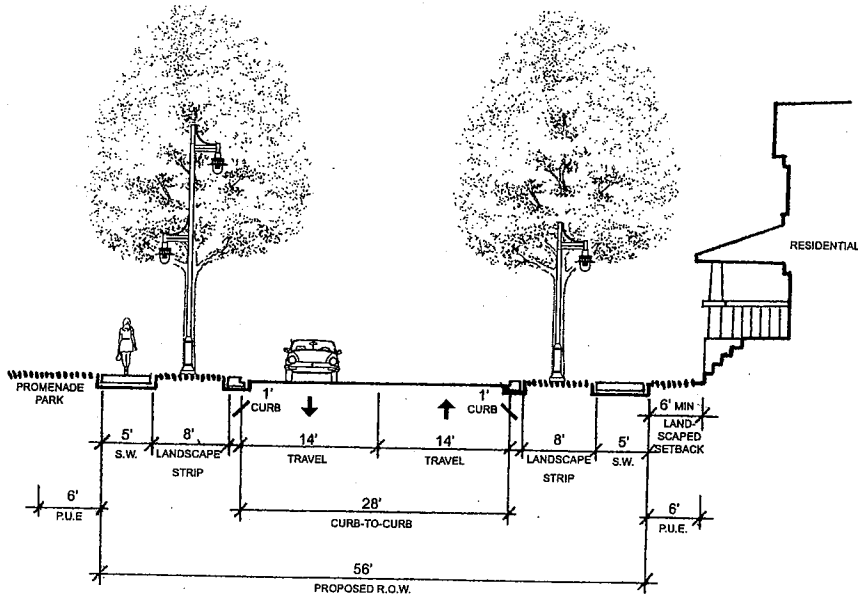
D.New.n: Harbor Way Cross Section at Residential ⑤
